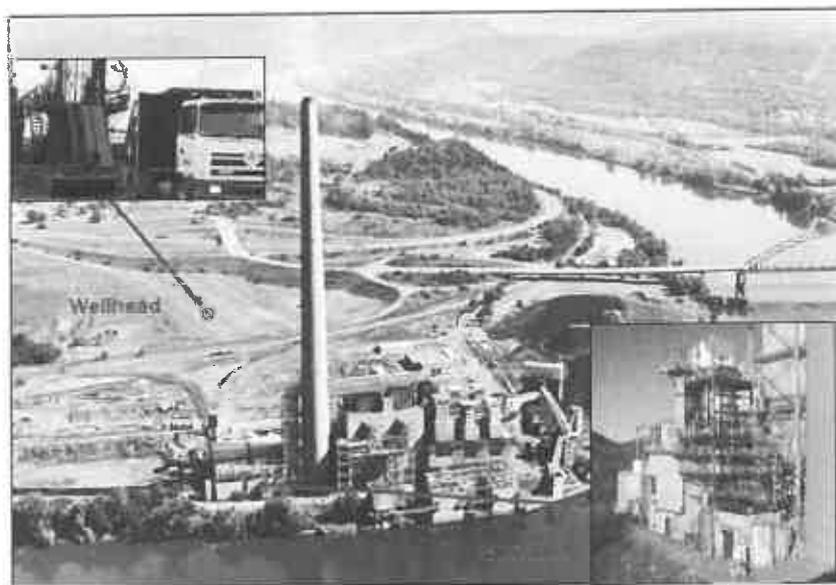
Site Layout of ECO Unit and Coal Plant
